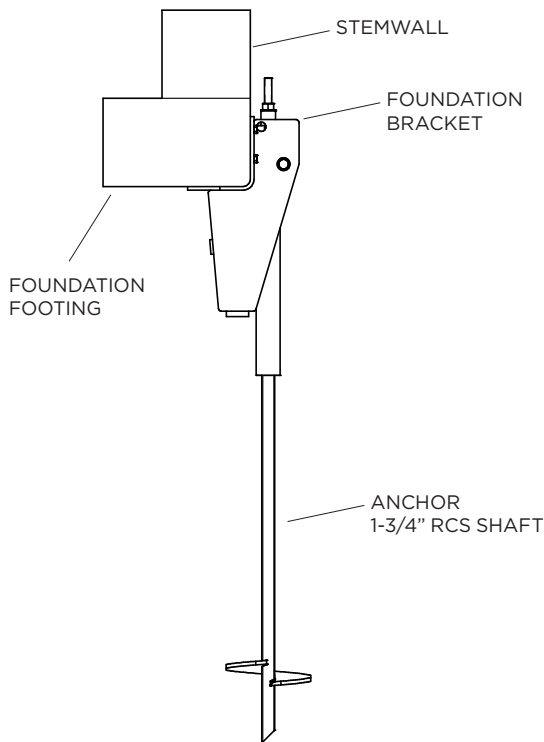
NEW CONSTRUCTION BRACKET ATTACHED TO SCREW-PILE FOR NEW FOUNDATION OR EXTENSION OF EXISTING FOUNDATION.
